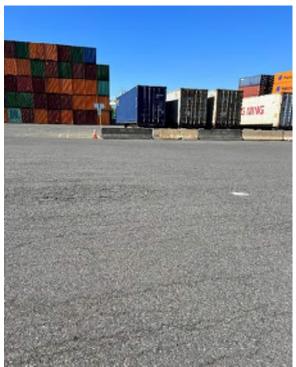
Typical Alligator Cracking of Asphalt Deck Overlay.
